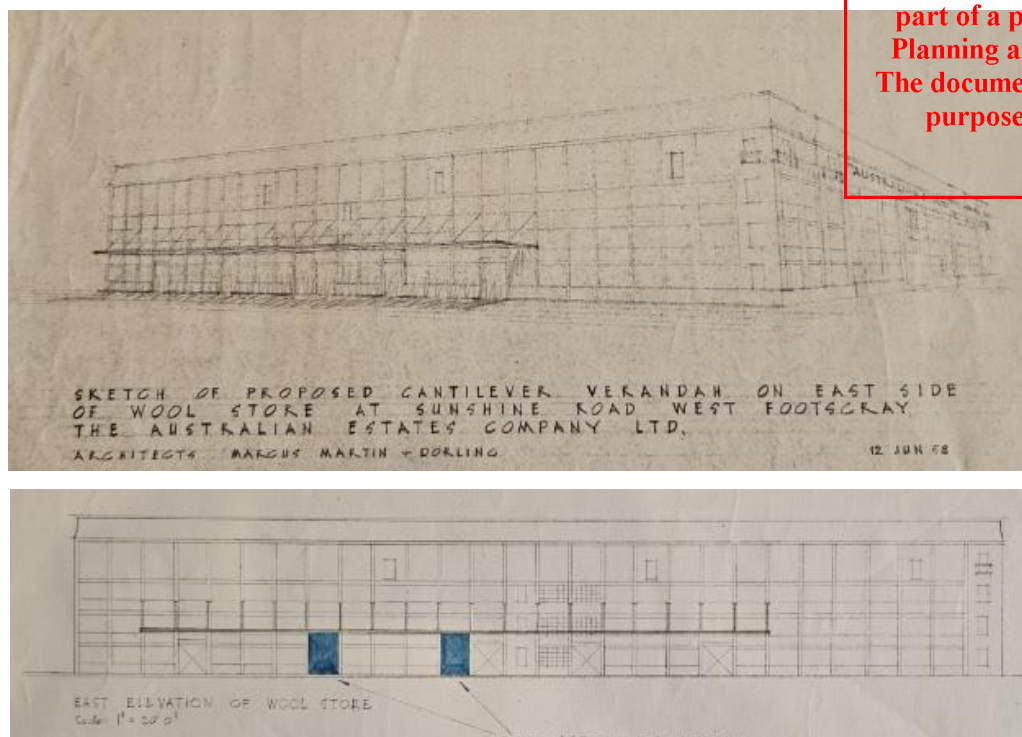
3D perspective sketch & elevation drawing of the proposed cantilever awning to east elevation. Source: State Library of Victoria.
